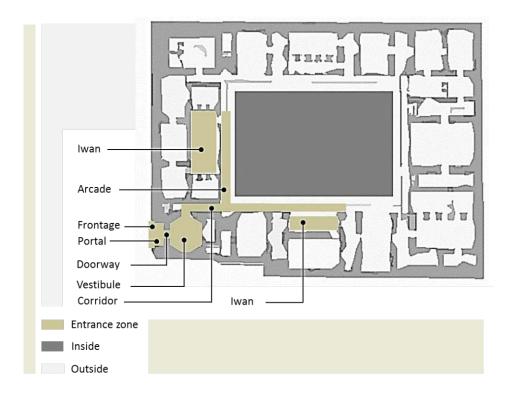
Entrance zones of a traditional house – Plan (Payamifar, 2020)
